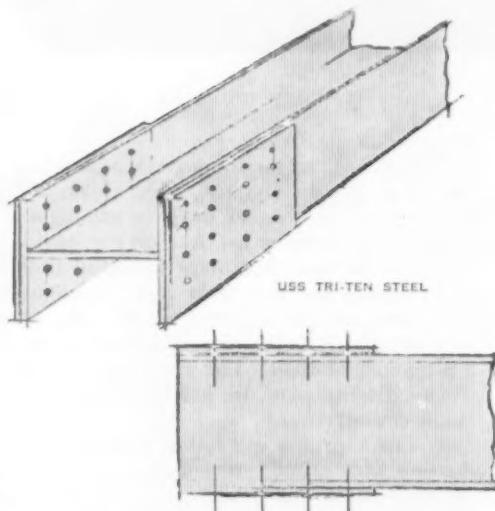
Tension joint detail, Carquinez Strait Bridge
